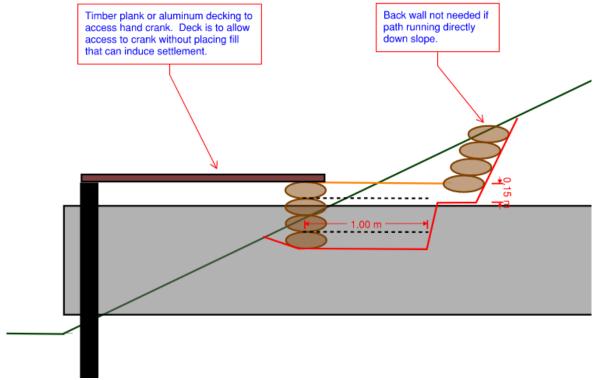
Typical detail for constructing path or working platform at the outfall.
